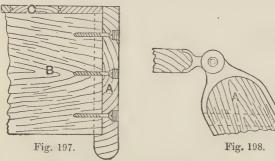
Horizontal Section through Step. Fig. 198.—Fastening at Top of Deck Ladder.
